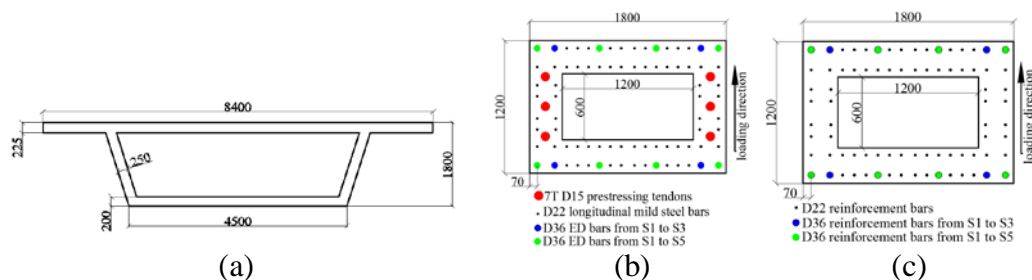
Details of the bridges, (a) cross-section of box-girder; (b) details of the precast segmental column and (c) details of the monolithic column section (mm)
